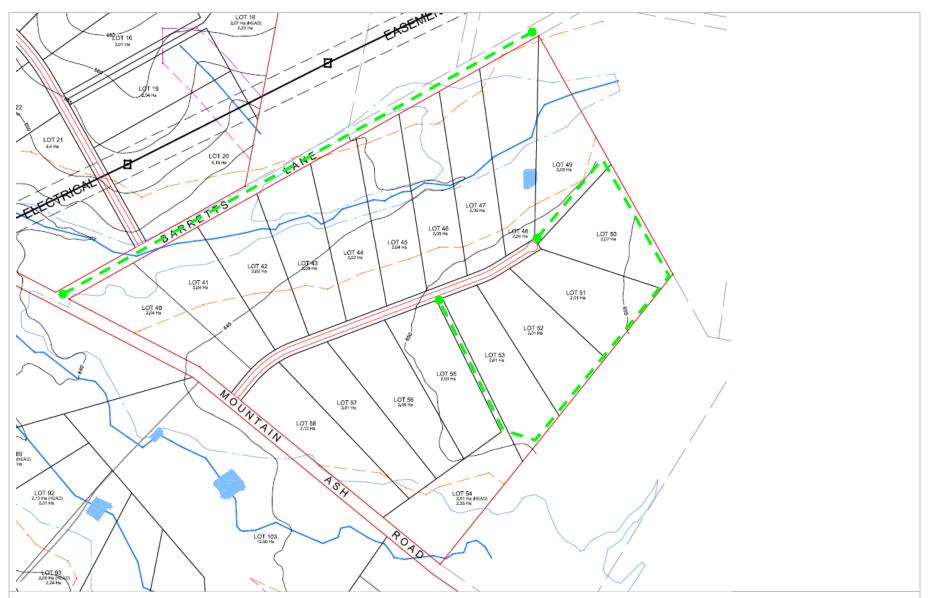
Precinct 2 - Emergency access via Barrett's Lane, a formed, sealed public road and private fire trail via Lot 49 to 54 tracking back onto the internal road system.
